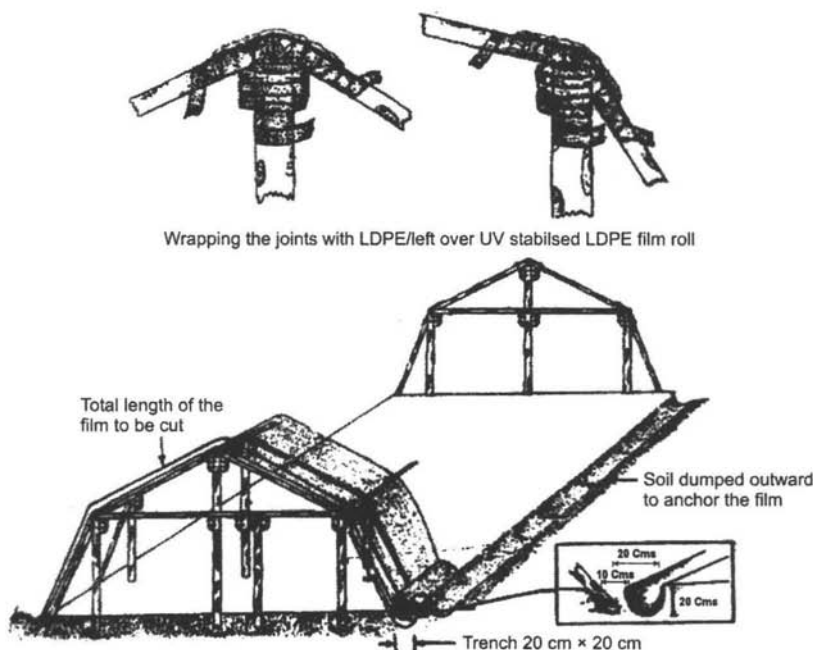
Cladding the structure and anchoring the film using soil trenches.
